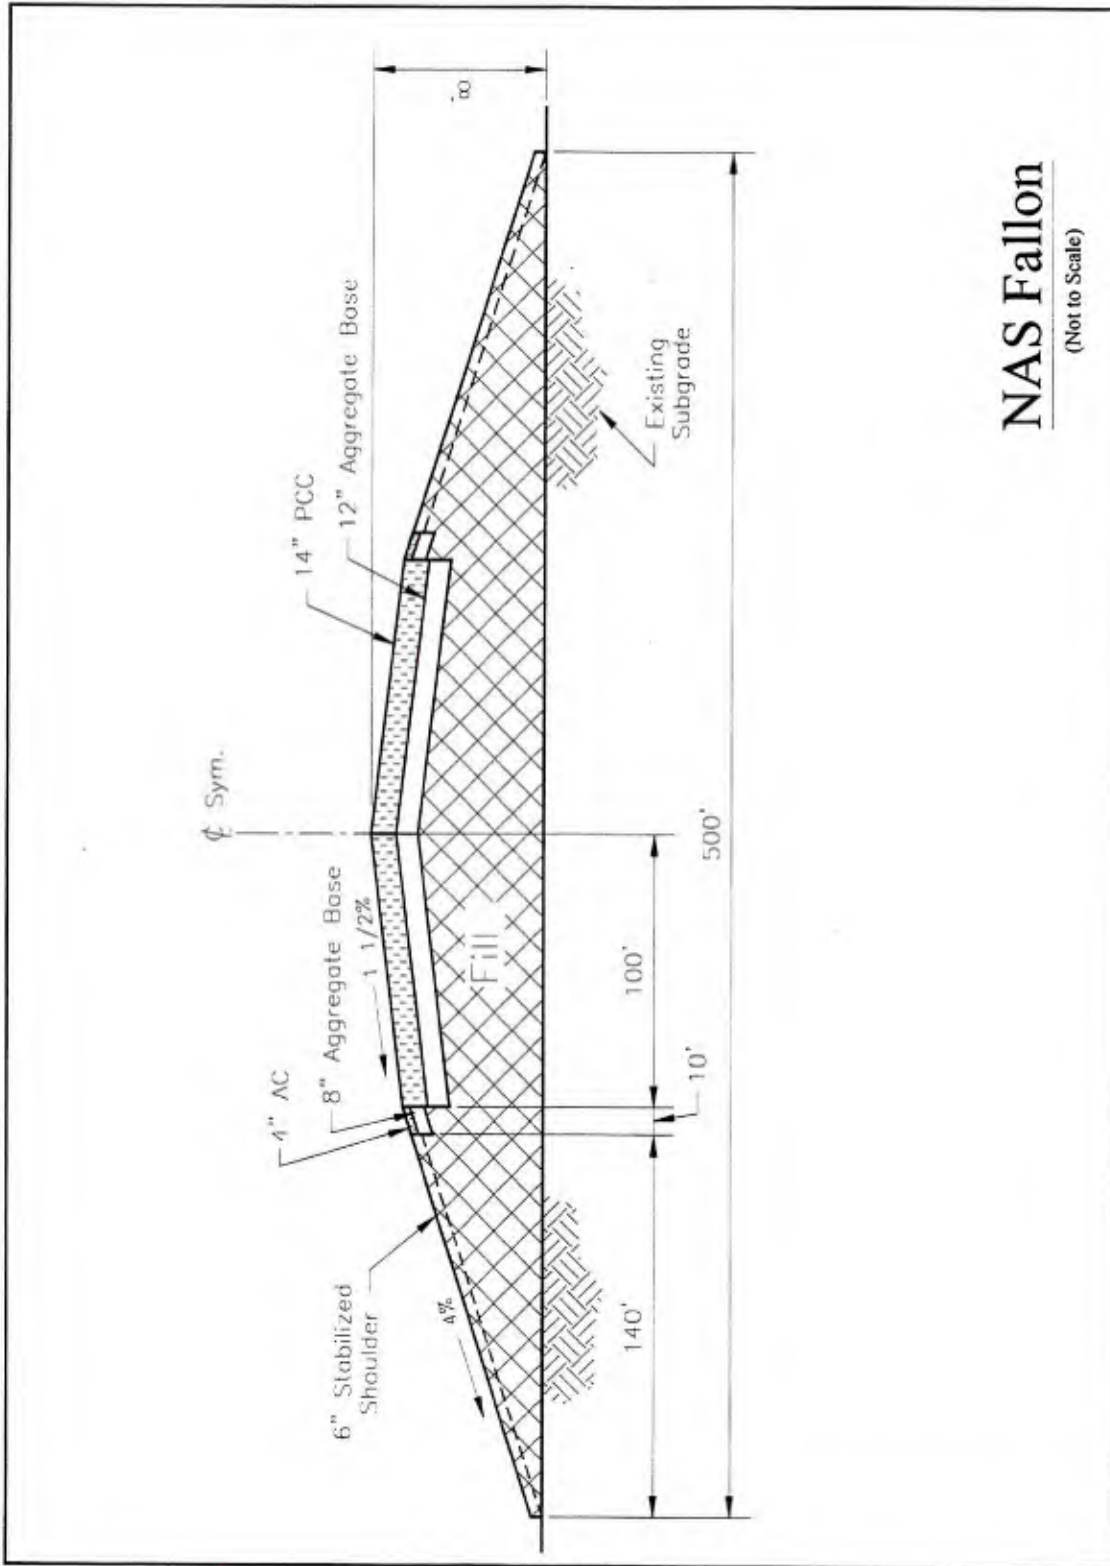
Typical cross section of proposed new Portland cement concrete runway.
